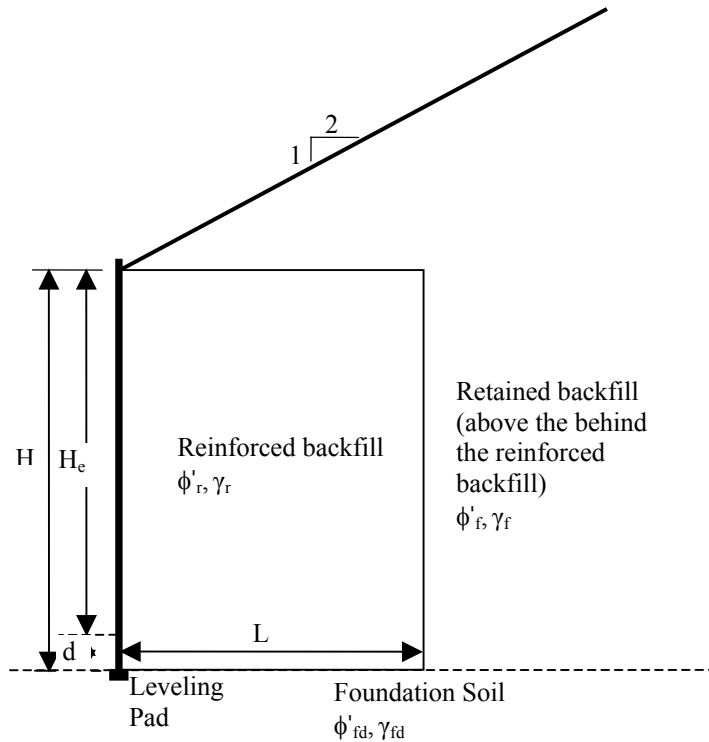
Configuration showing various parameters for analysis of a MSE wall with sloping backfill (not-to-scale).
